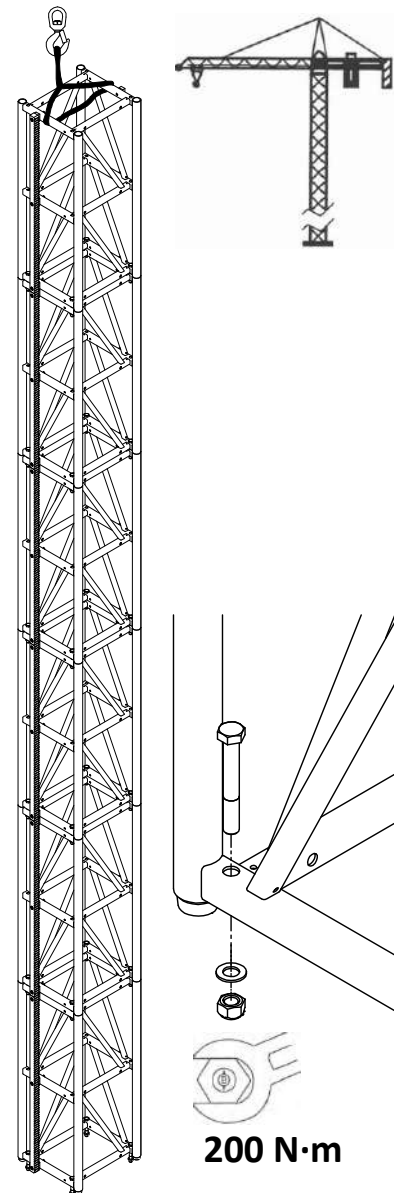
DETAIL OF MAST CONFIGURATION IN THE COLUMN H>150 m
